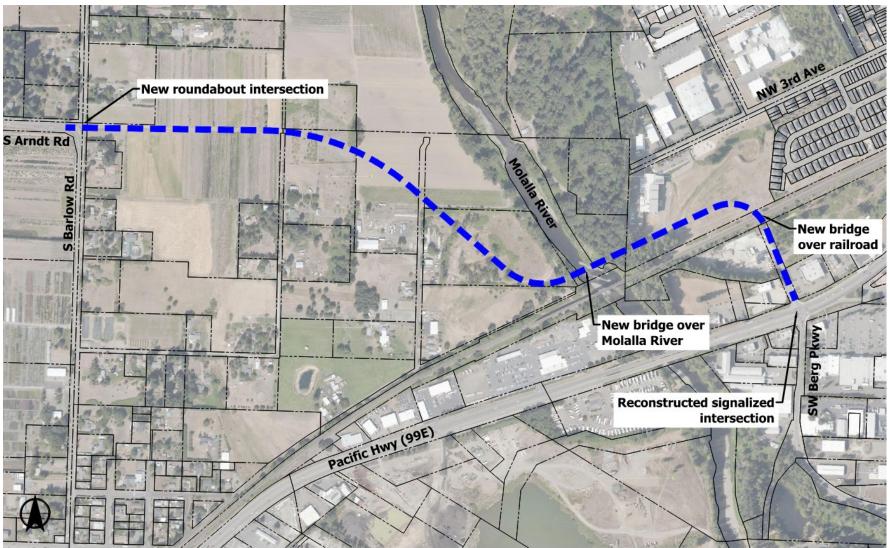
Long-Term Arndt Road Extension Alignment Alternative 4
